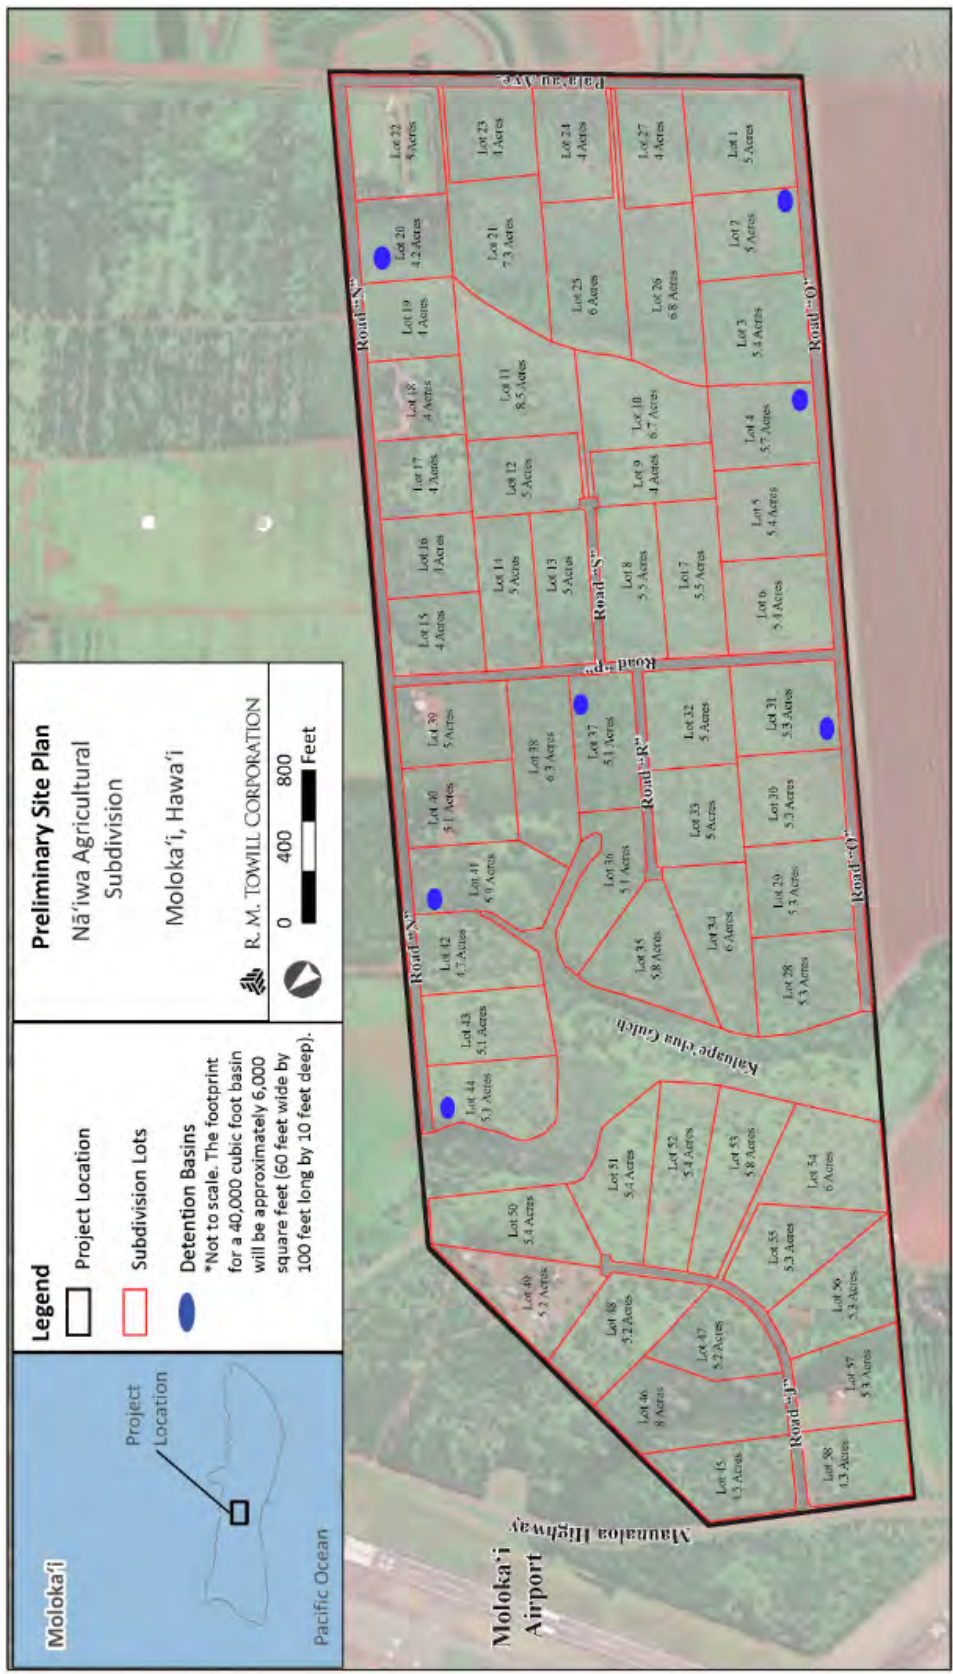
Preliminary Nā'īwa Agricultural Subdivision Site Plan
